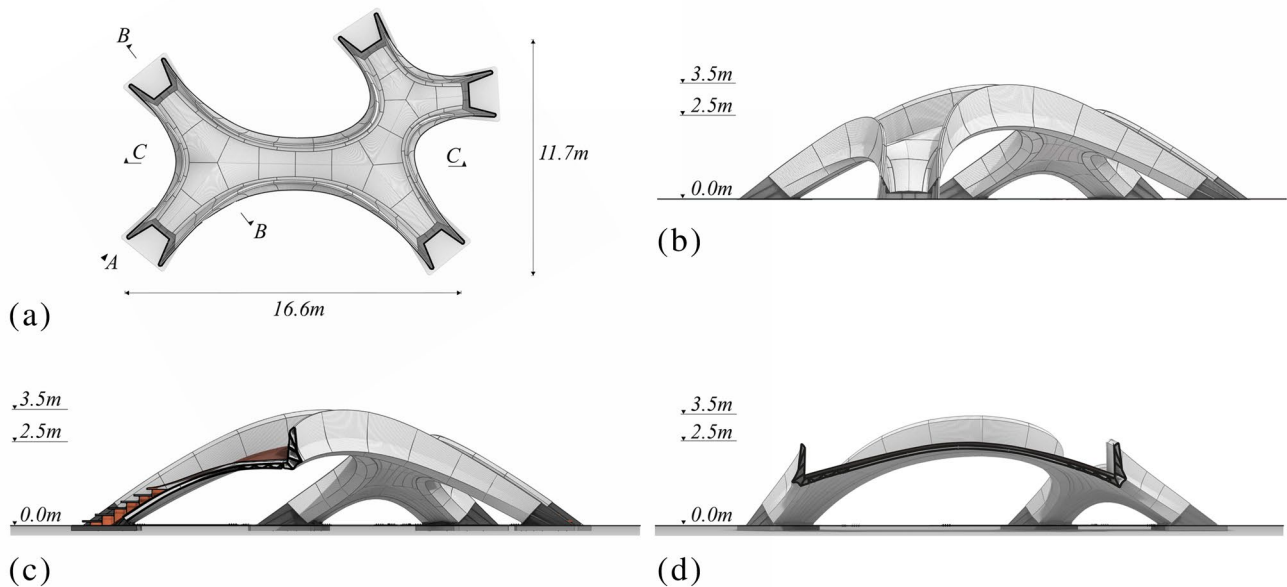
Schematic drawings - (a) plan, (b) elevation A, (c) section BB, and (d) section CC
